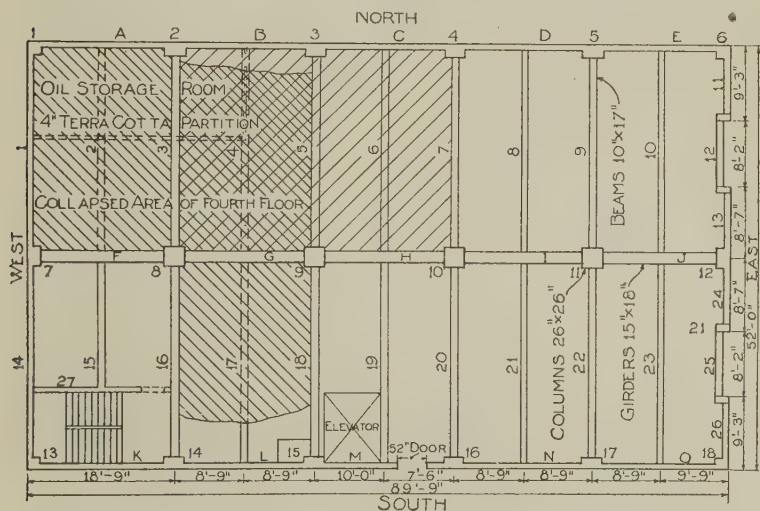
PLAN OF REINFORCED-CONCRETE WAREHOUSE, SHOWING COLLAPSED AREA ON FOURTH FLOOR AND LOCATION OF LOAD TEST PANELS.
